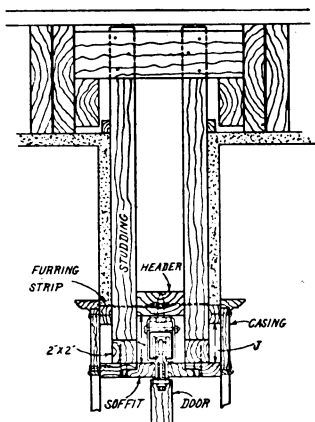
CROSS-SECTION SHOWING TYPICAL OVERHEAD CONSTRUCTION FOR SUPPORTING TRACK.
